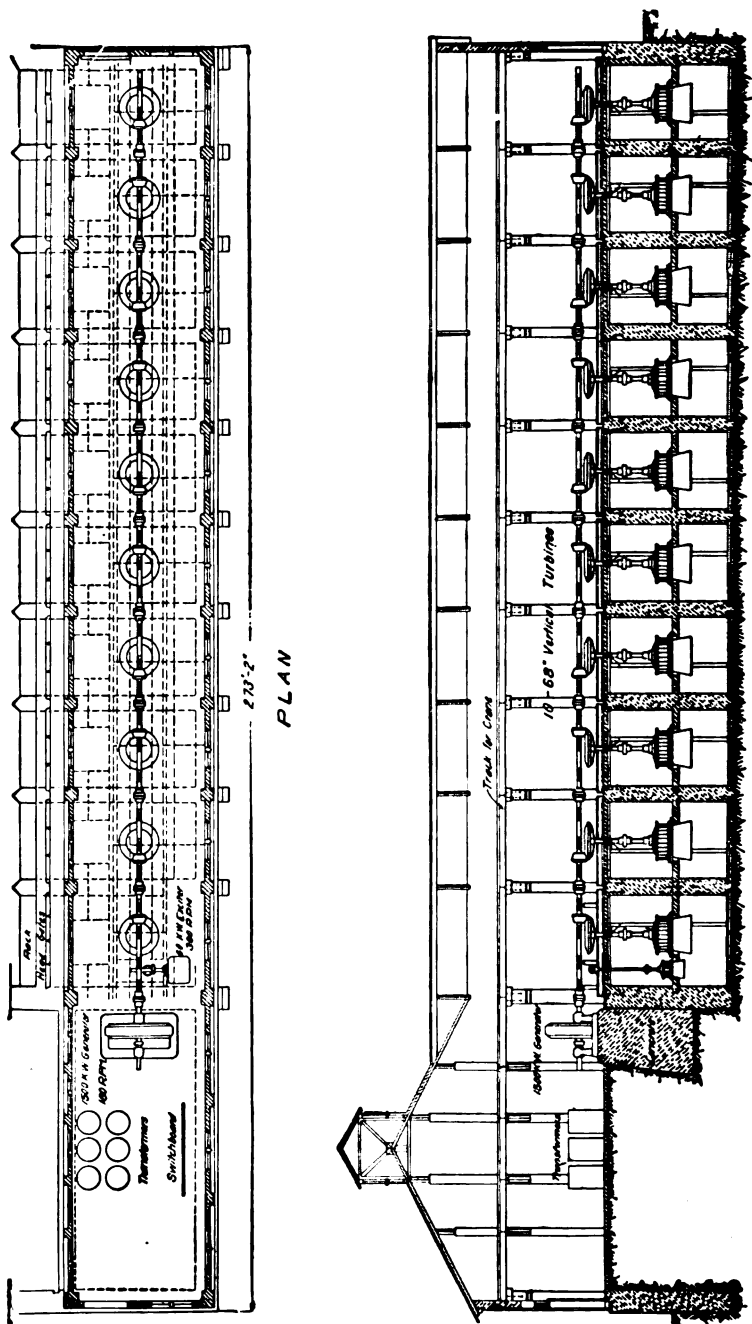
Plant of South Bend Electric Co., Buchanan, Mich. Vertical Turbine in Open Penstock Geared to Common Jack shaft.
